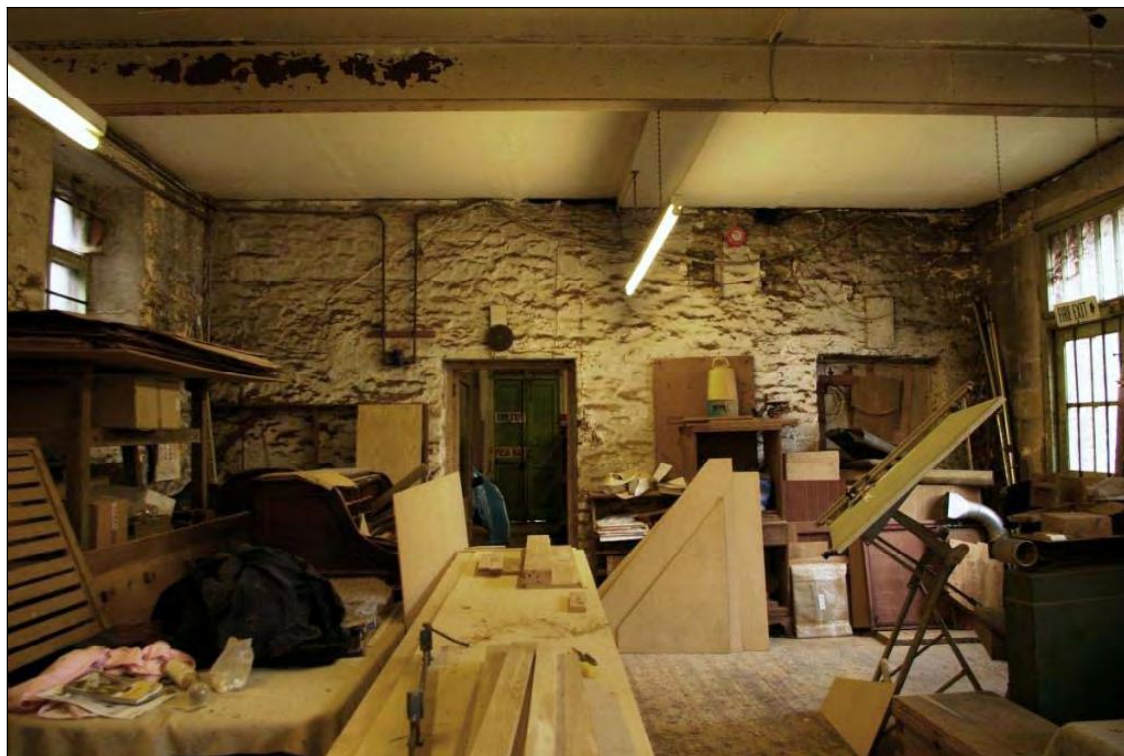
The south wall of the ground floor of the east wing, the former exterior north wall of the south wing. With the small square blocked window to the west and the angled scar of the roofline of a former building to the east at first floor height, viewed from the north.
